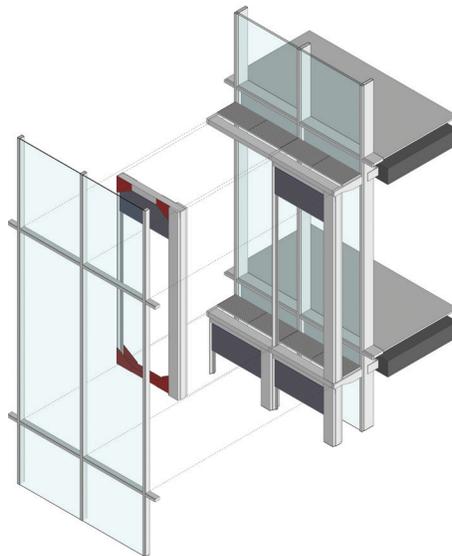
STVB installation in Scenario 1 on a multi-storey ventilated double-skin façade
